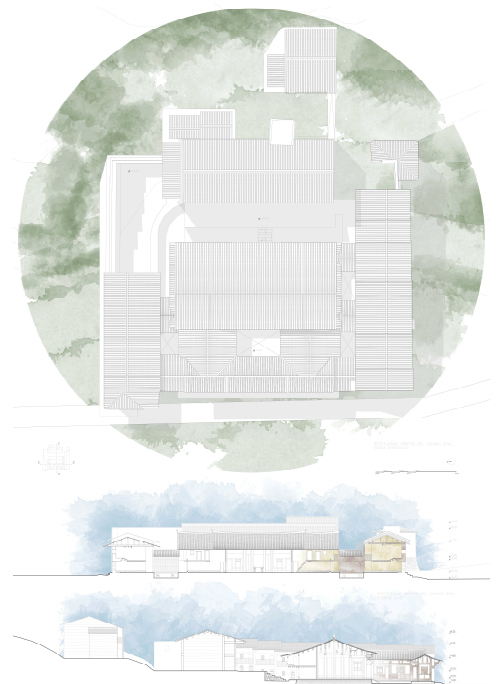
Graphic elaboration of the *Yue Zhuangzhai* survey activities. Roofs plan and sections.
